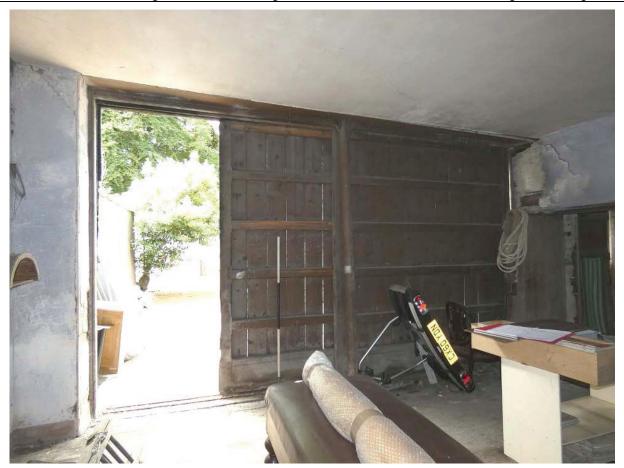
Sliding wagon doorway in the south elevation of Room G4, viewed from the north
